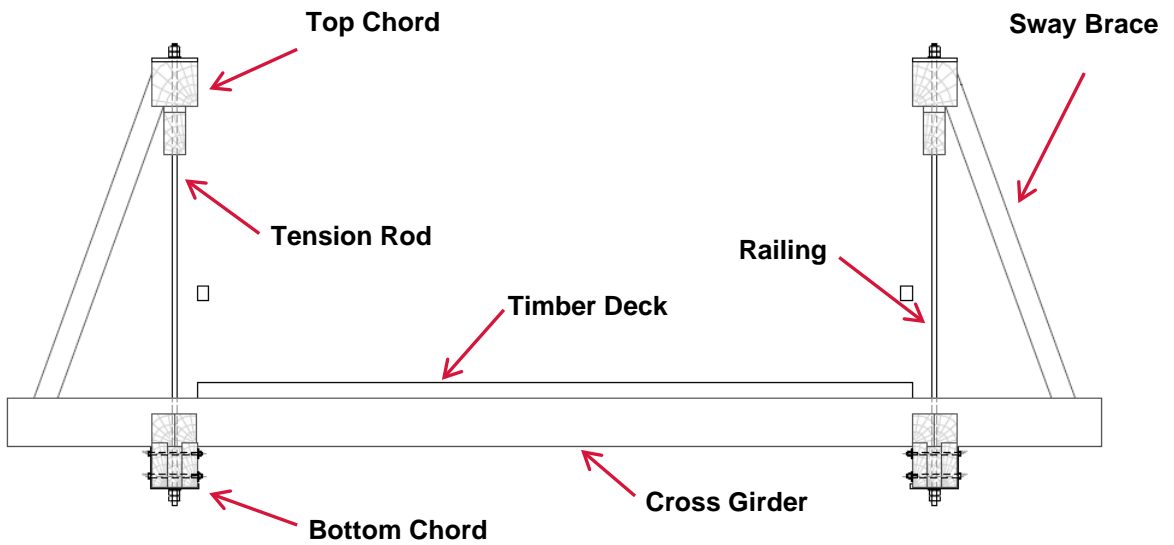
Diagram showing Old PWD truss terminology from elevation.
